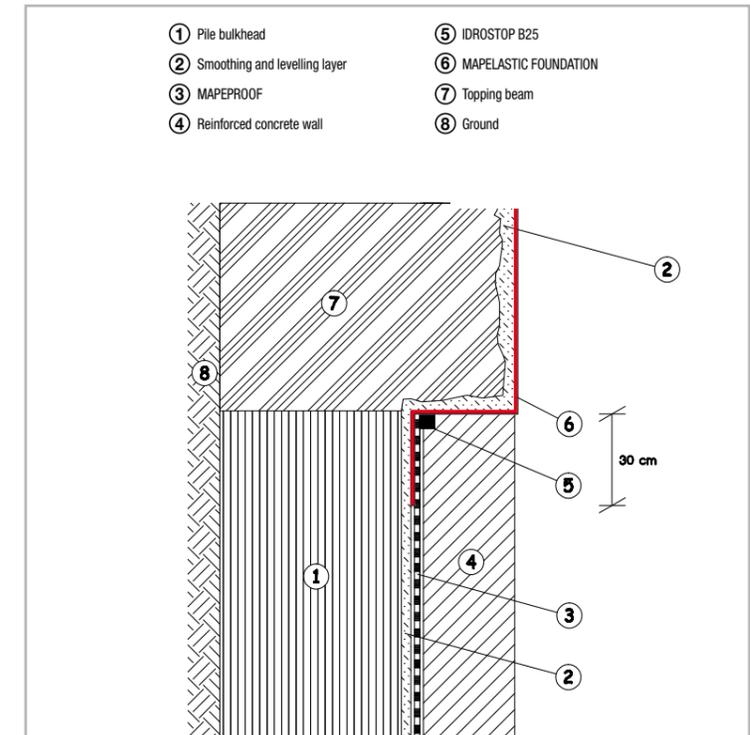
Waterproofing the topping beam on a bulkhead
